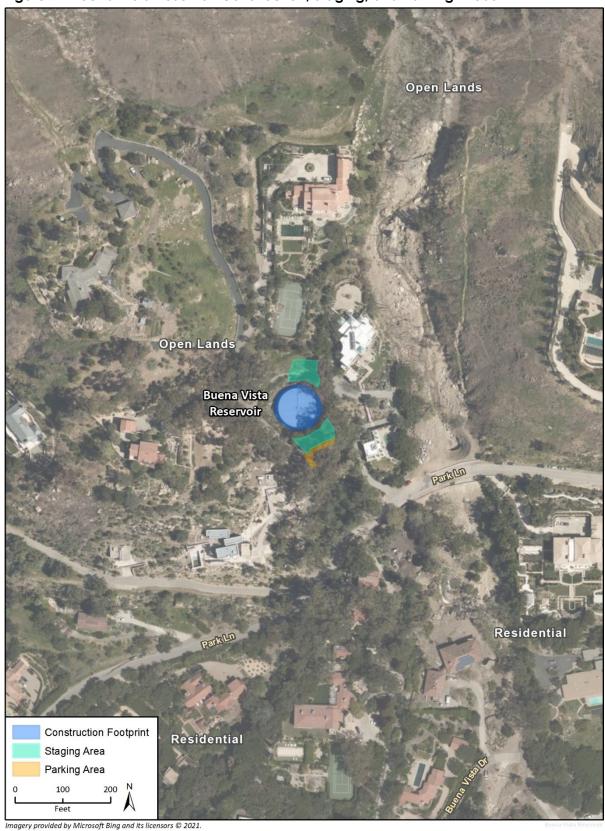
Buena Vista Reservoir Construction, Staging, and Parking Areas
